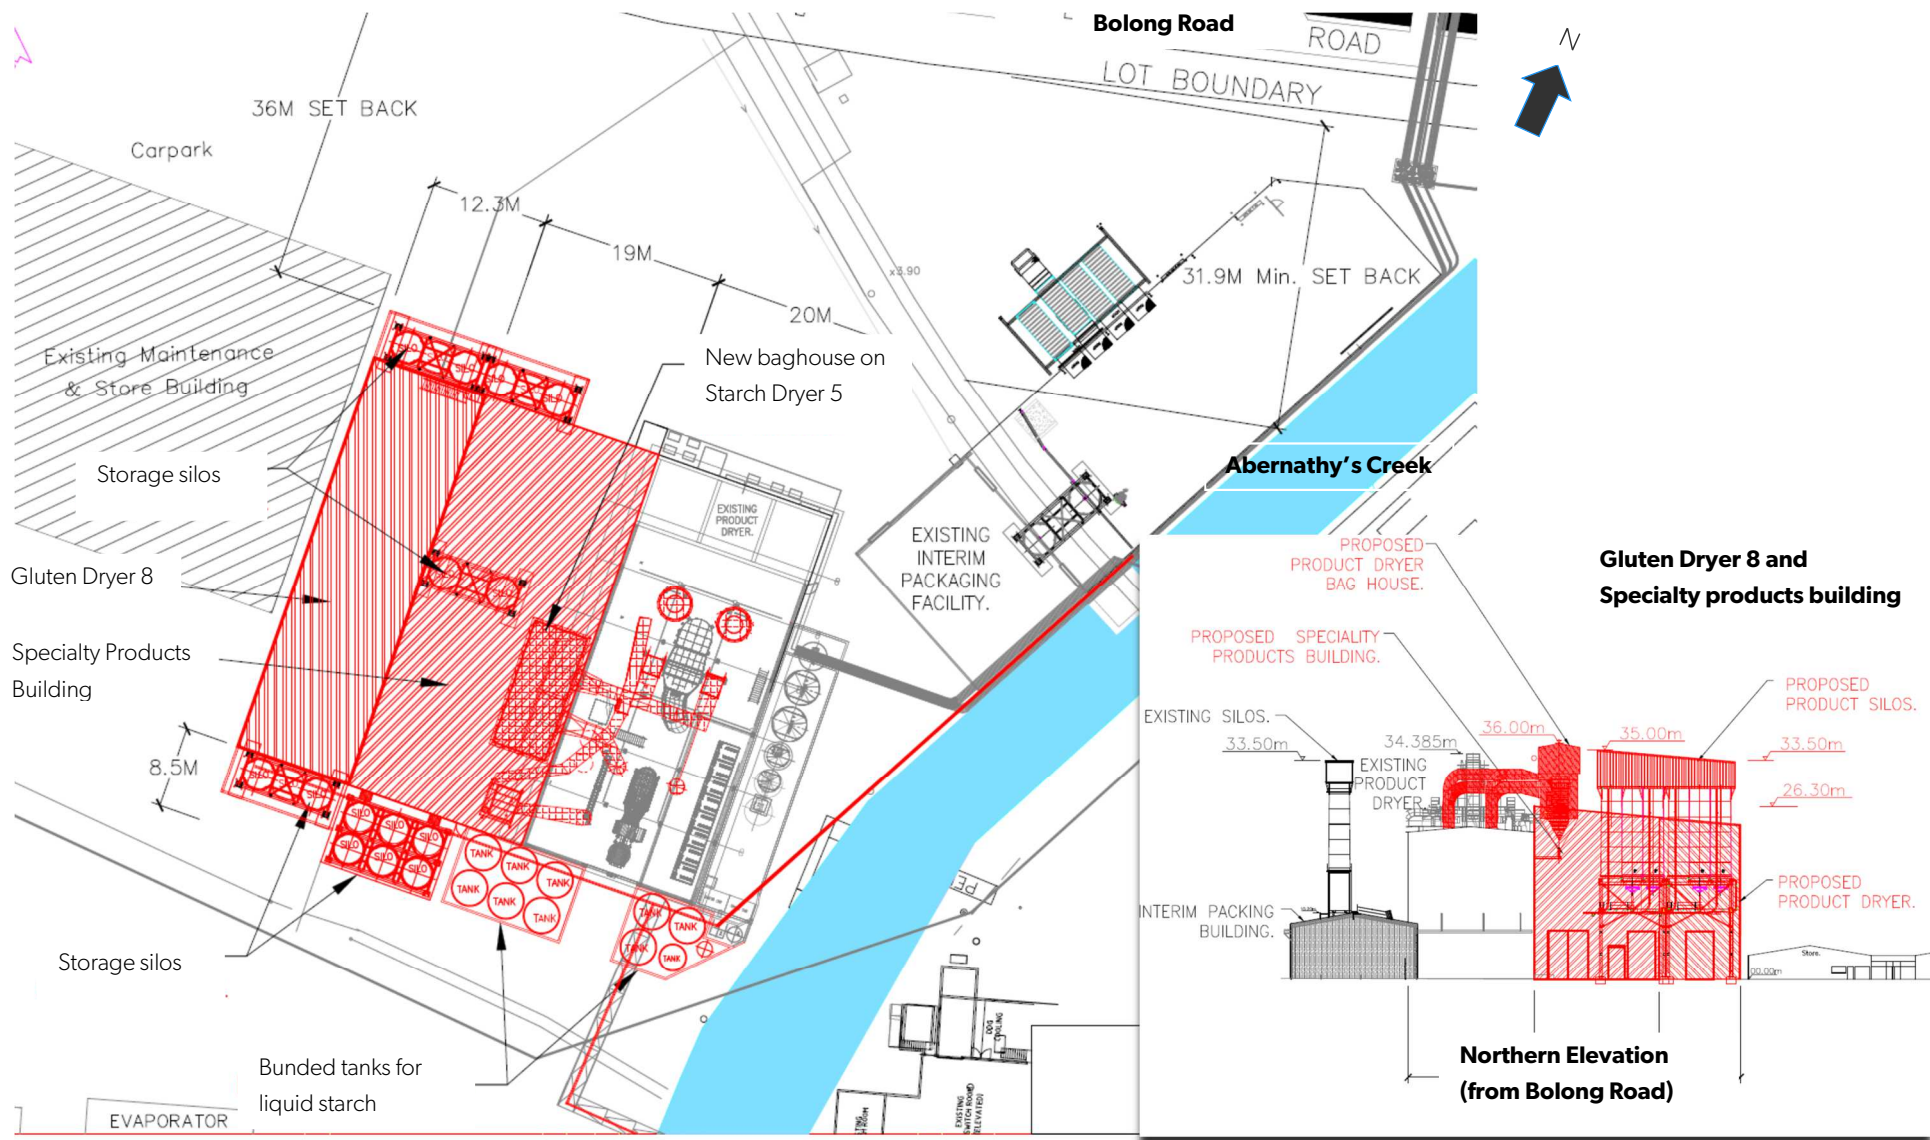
Proposed Gluten Dryer 8, Specialty Products Building and Storage Silos
